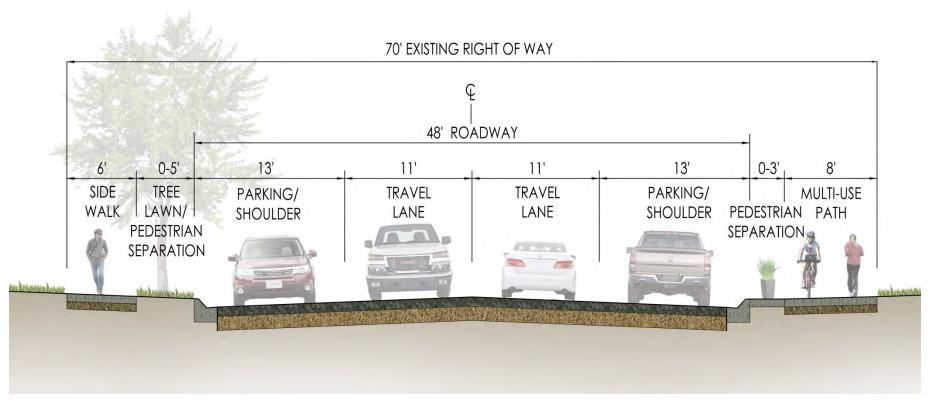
Recommended Conceptual Typical Section in Areas Requiring On-street Parking Limited 70' Right-of-way (Looking South)
